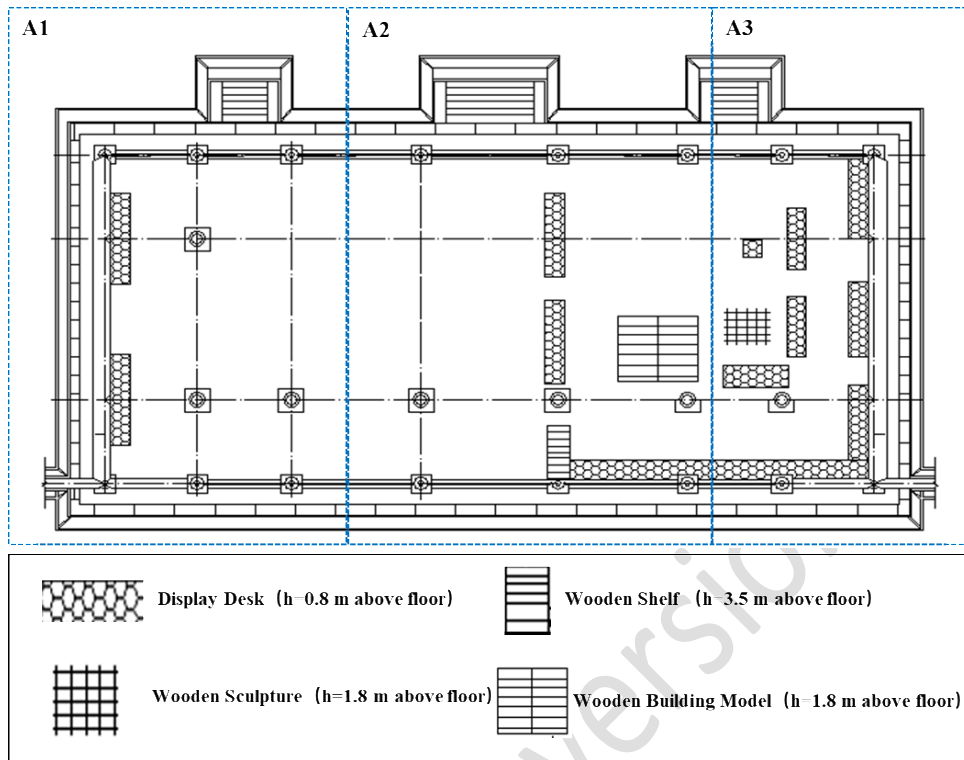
Layouts of indoor furniture in the temple hall (A1, A2 and A3 are three areas).
